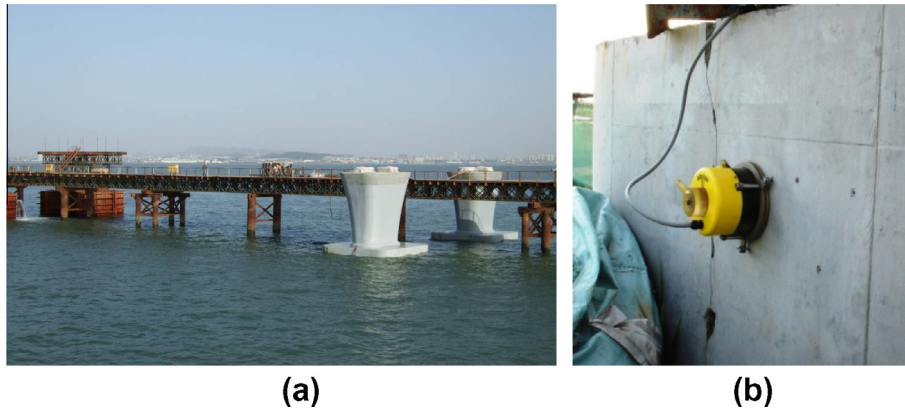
Qingdao Bay Bridge, China (a) and application of Permit apparatus on bridge (b).
